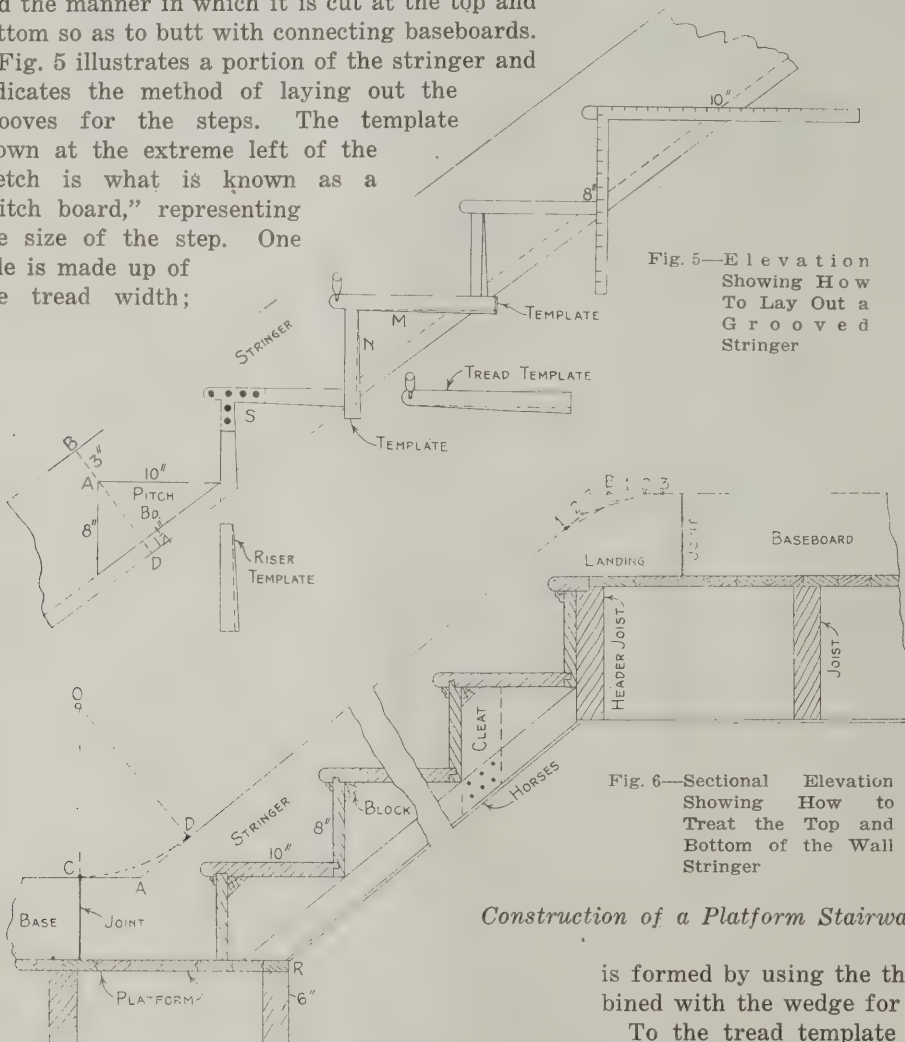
Elevation Showing How To Lay Out a Grooved Stringer
